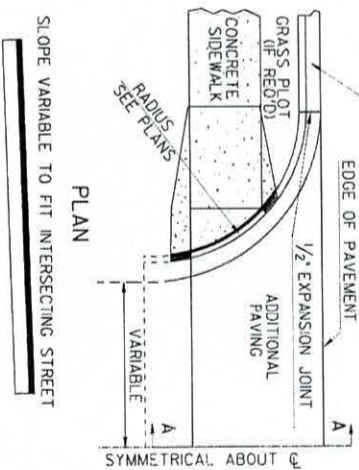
DETAIL OF CONCRETE VALLEY GUTTER WITH CURB
